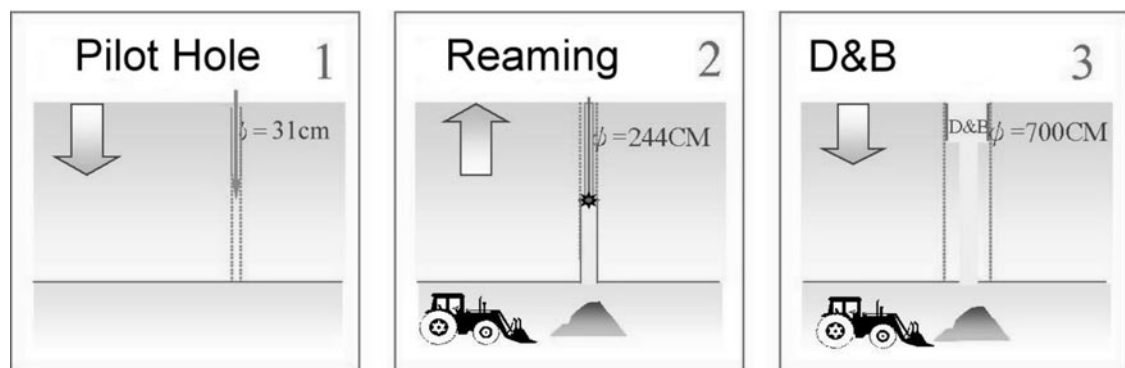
Sequential steps in vertical shaft excavation through raise boring method
